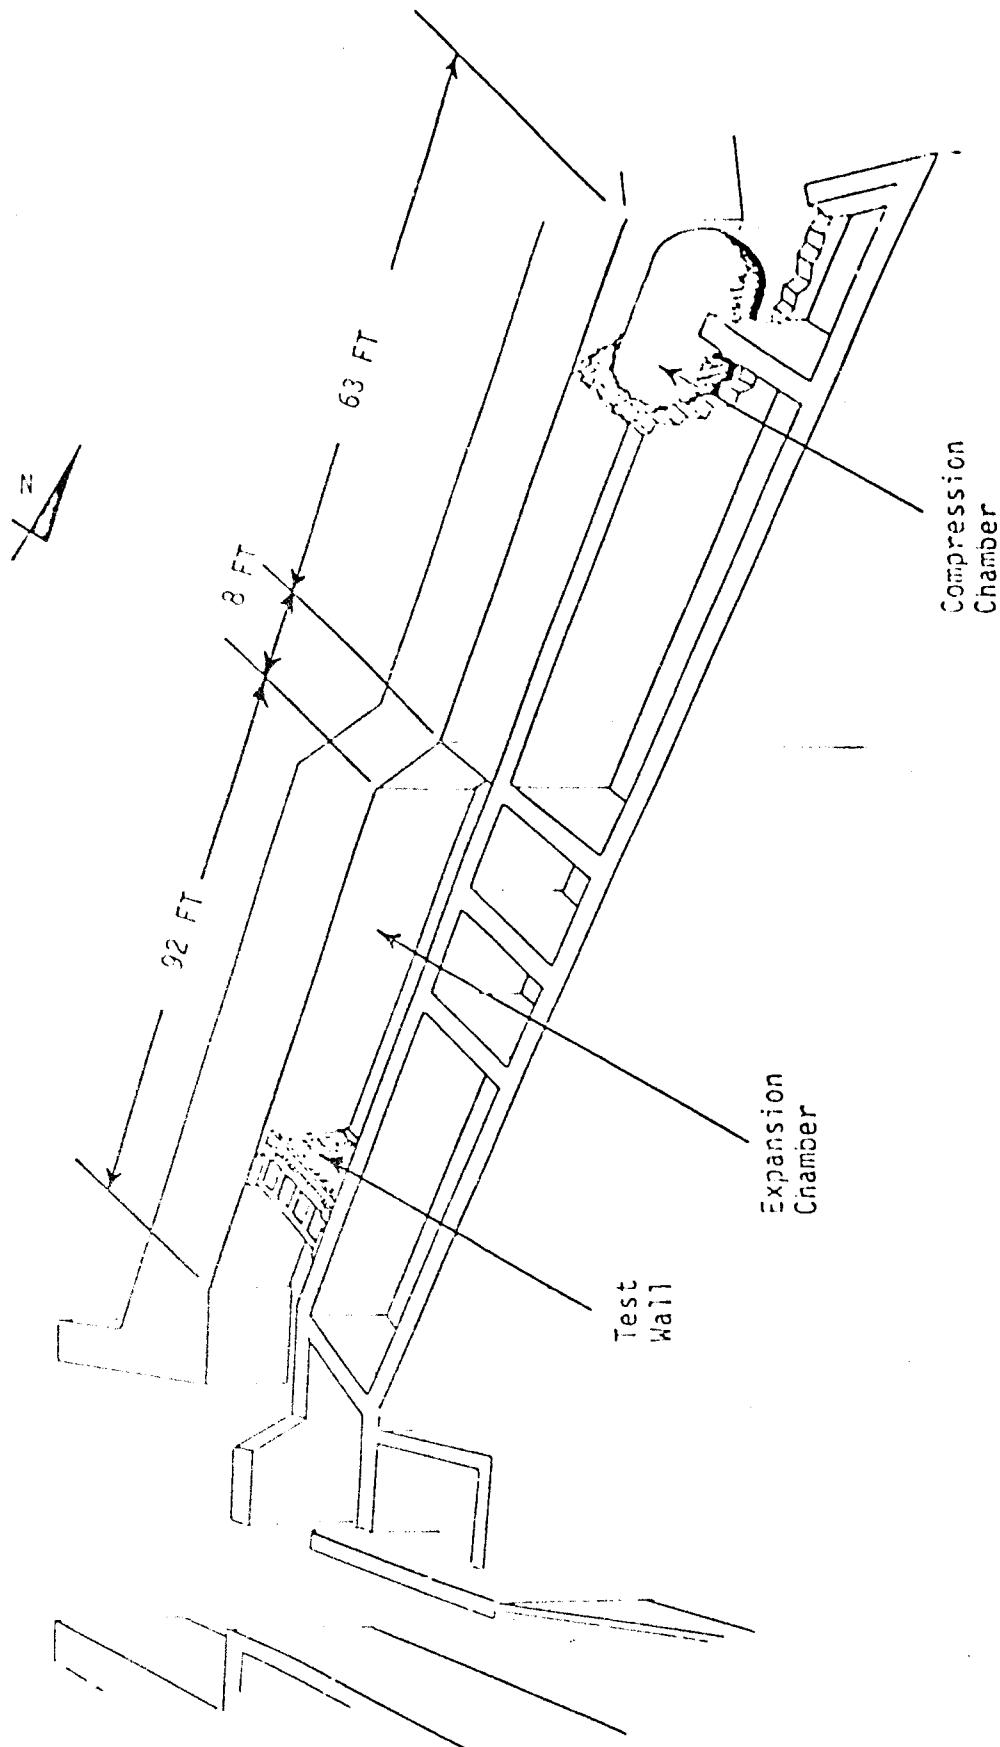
Cutaway View of Shock Tunnel Showing Wall in Place.
